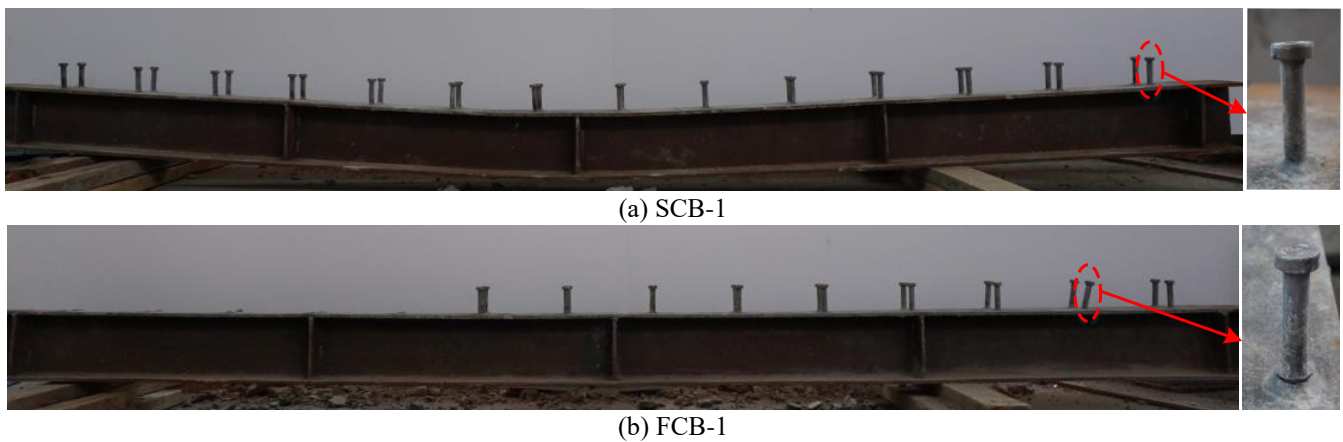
Static and fatigue failure modes of the studs in the test beam
